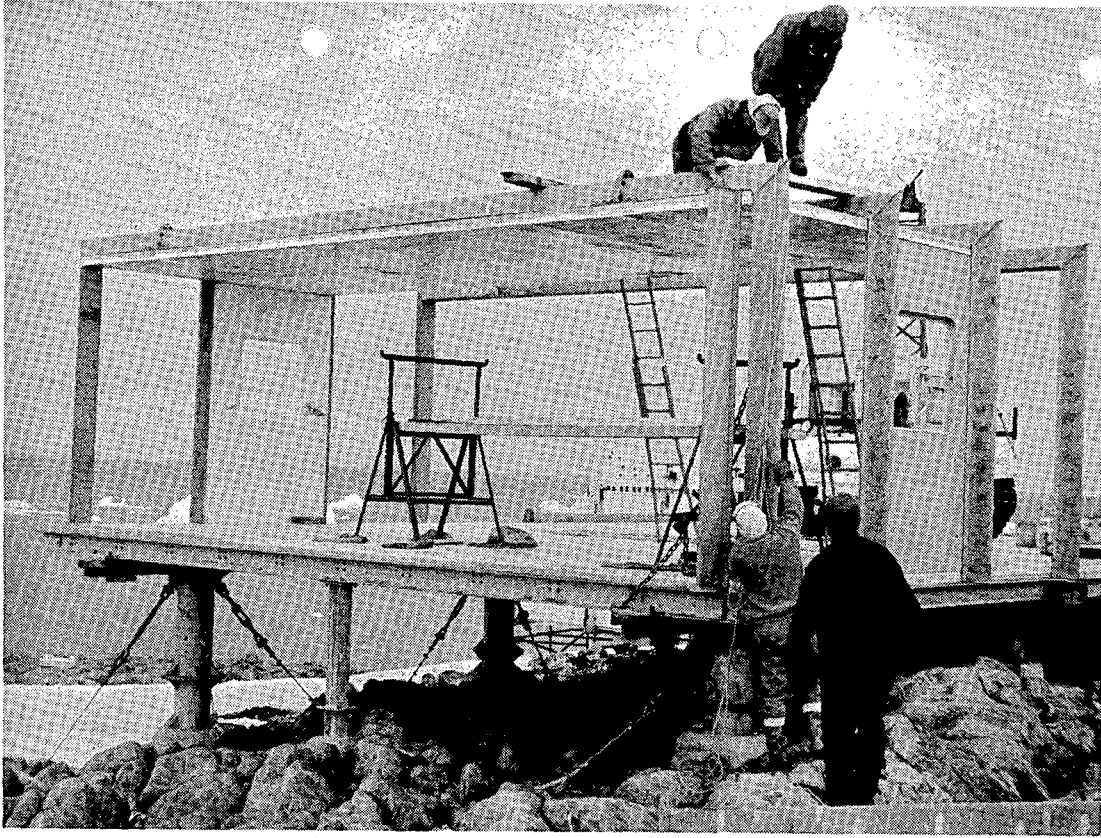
Laboratory building. 4 spans are lifted; 2 rows of roof panels are laid as 2 window panels; 1 upright is mounting.
